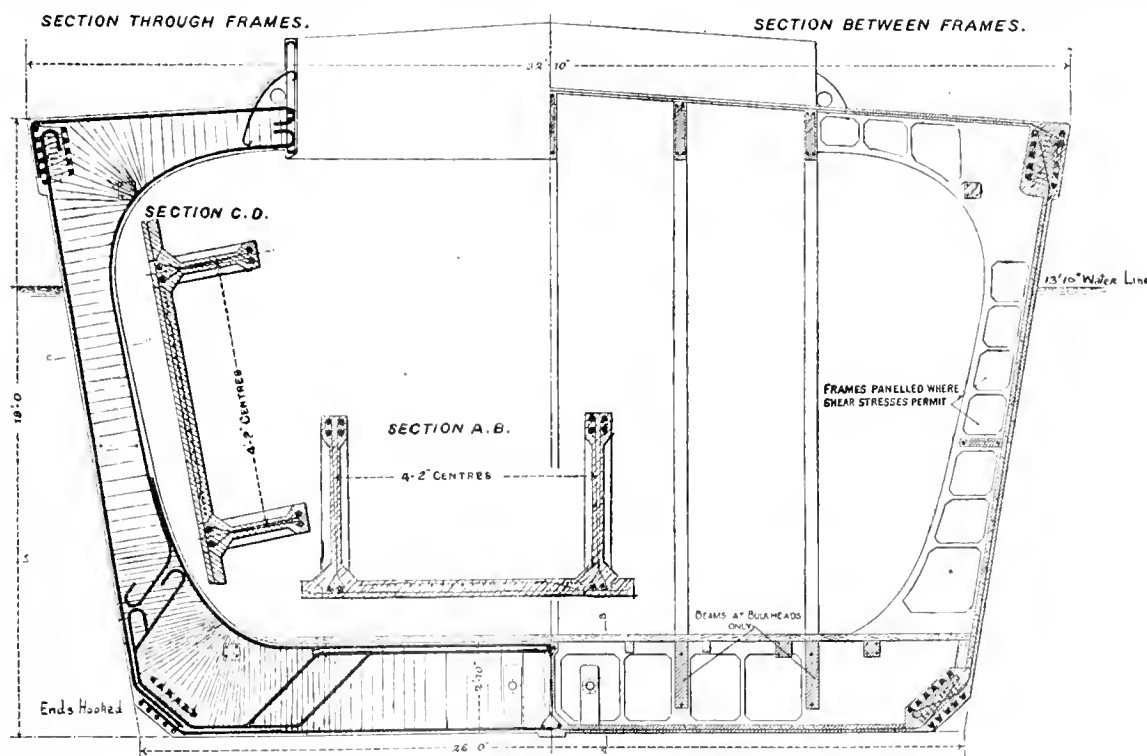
SECTION THROUGH FRAMES OF WALLER TYPE OF REINFORCED-CONCRETE SHIP
